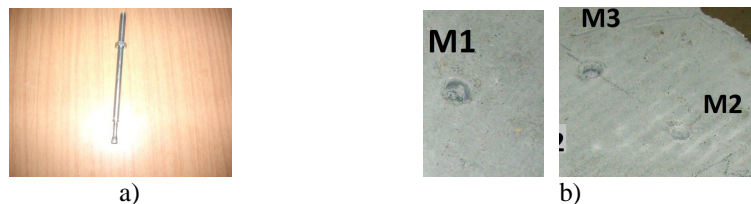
Bolt anchor failure mode M1, M2 and M3 in non-cracked concrete: a) rod anchor after pulling-out; b) the areas surrounding the holes after pull-out.
